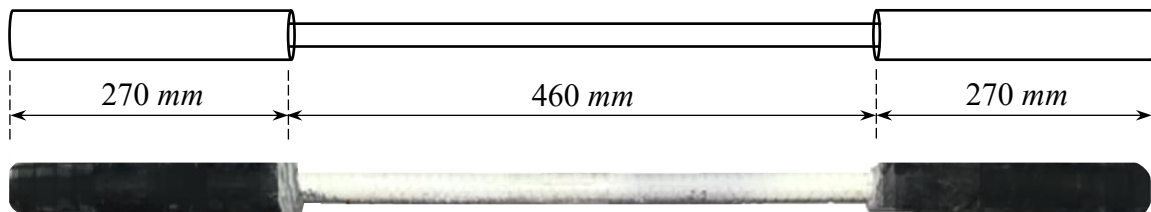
Schematic of GFRP bar specimen with steel pipe anchors at both ends
